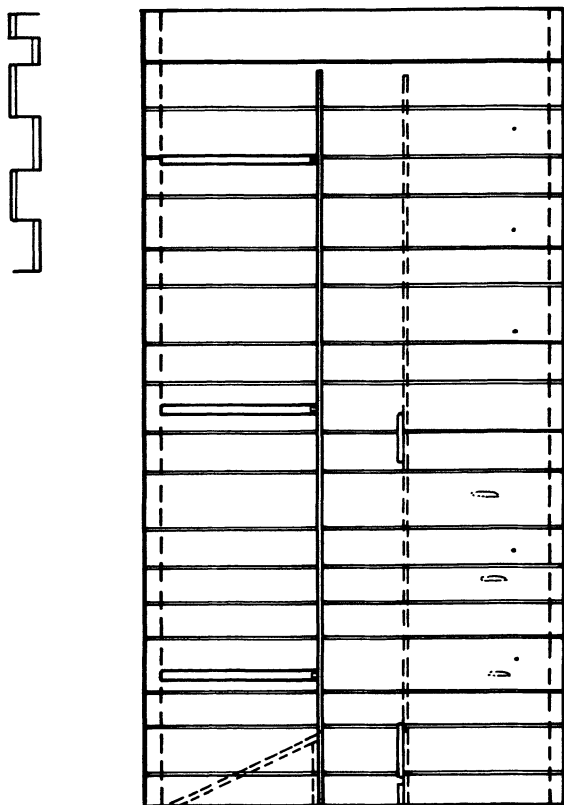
Interior elevation of east wall shelving, Store at Marmion Plantation. Measured by Carl Lounsbury and author. Drawing by Carl Lounsbury.
